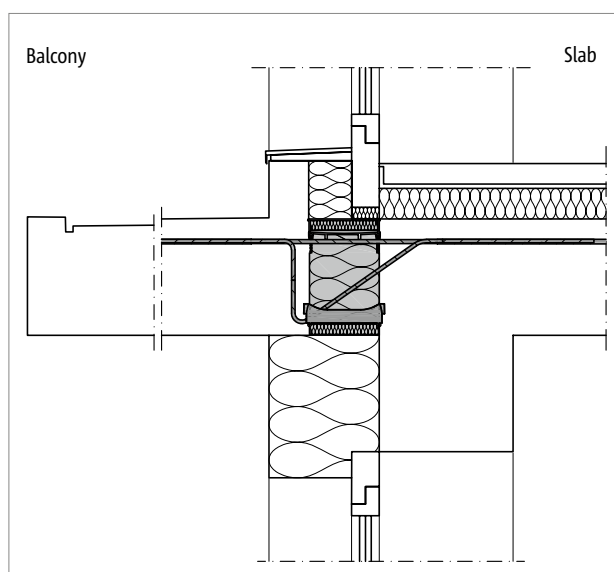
Schöck Isokorb® XT type K: Connection with window detail above and below the connection
